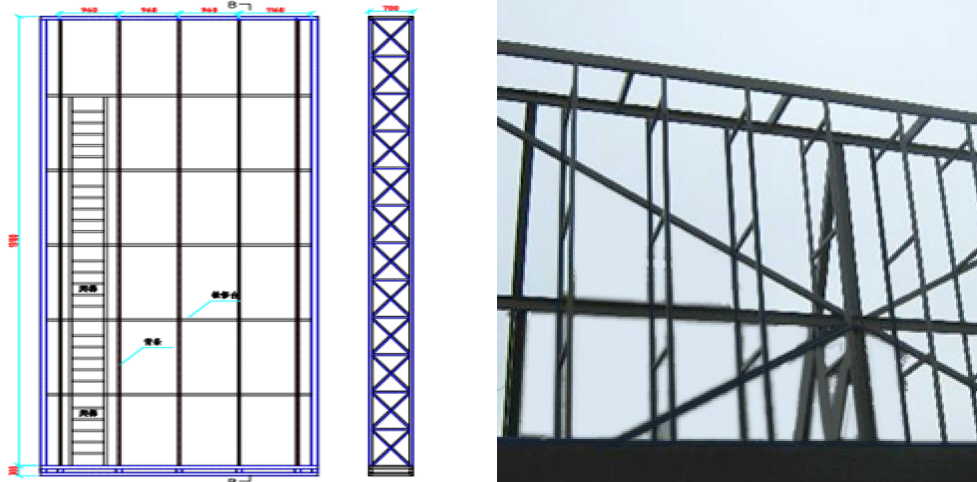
(Left) Steel Support structure design, and (right) actual steel support.
